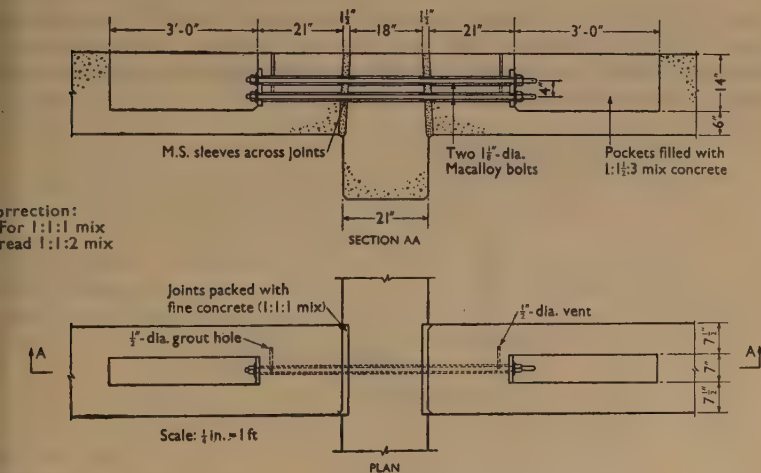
TYPICAL DETAILS OF PRESTRESSED CONNEXION BETWEEN BEAMS
